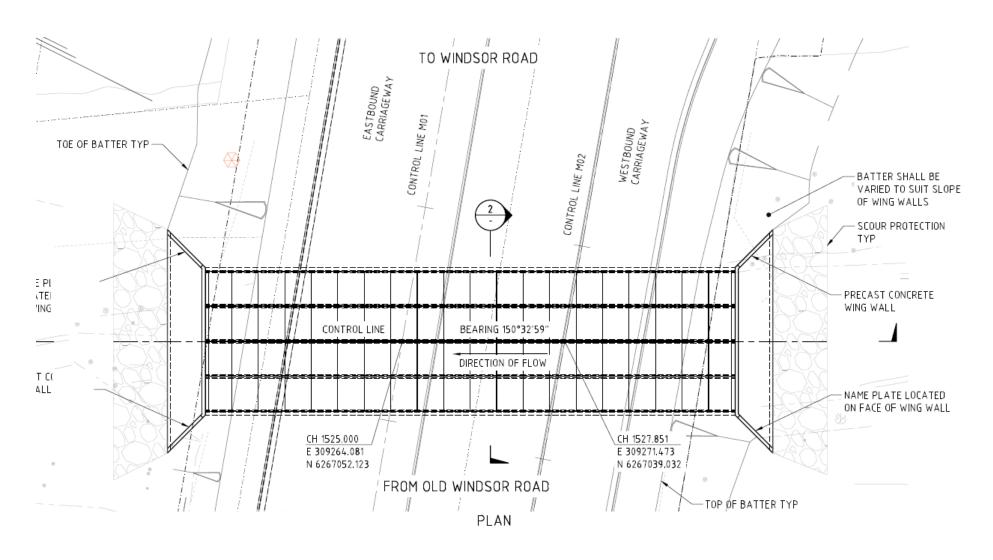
Proposed layout of culverts at Elizabeth Macarthur Creek
